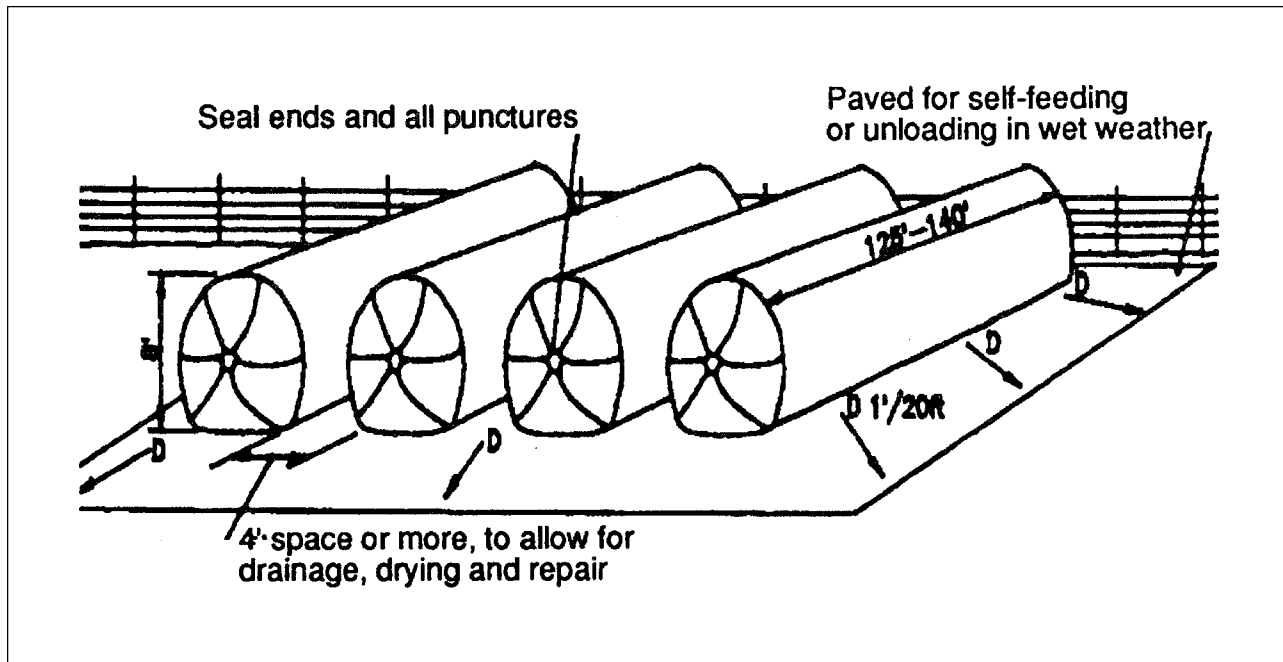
Horizontal Silo. *Source:* Beef Housing and Equipment Handbook, MWPS-6, Midwest Plan Service.
